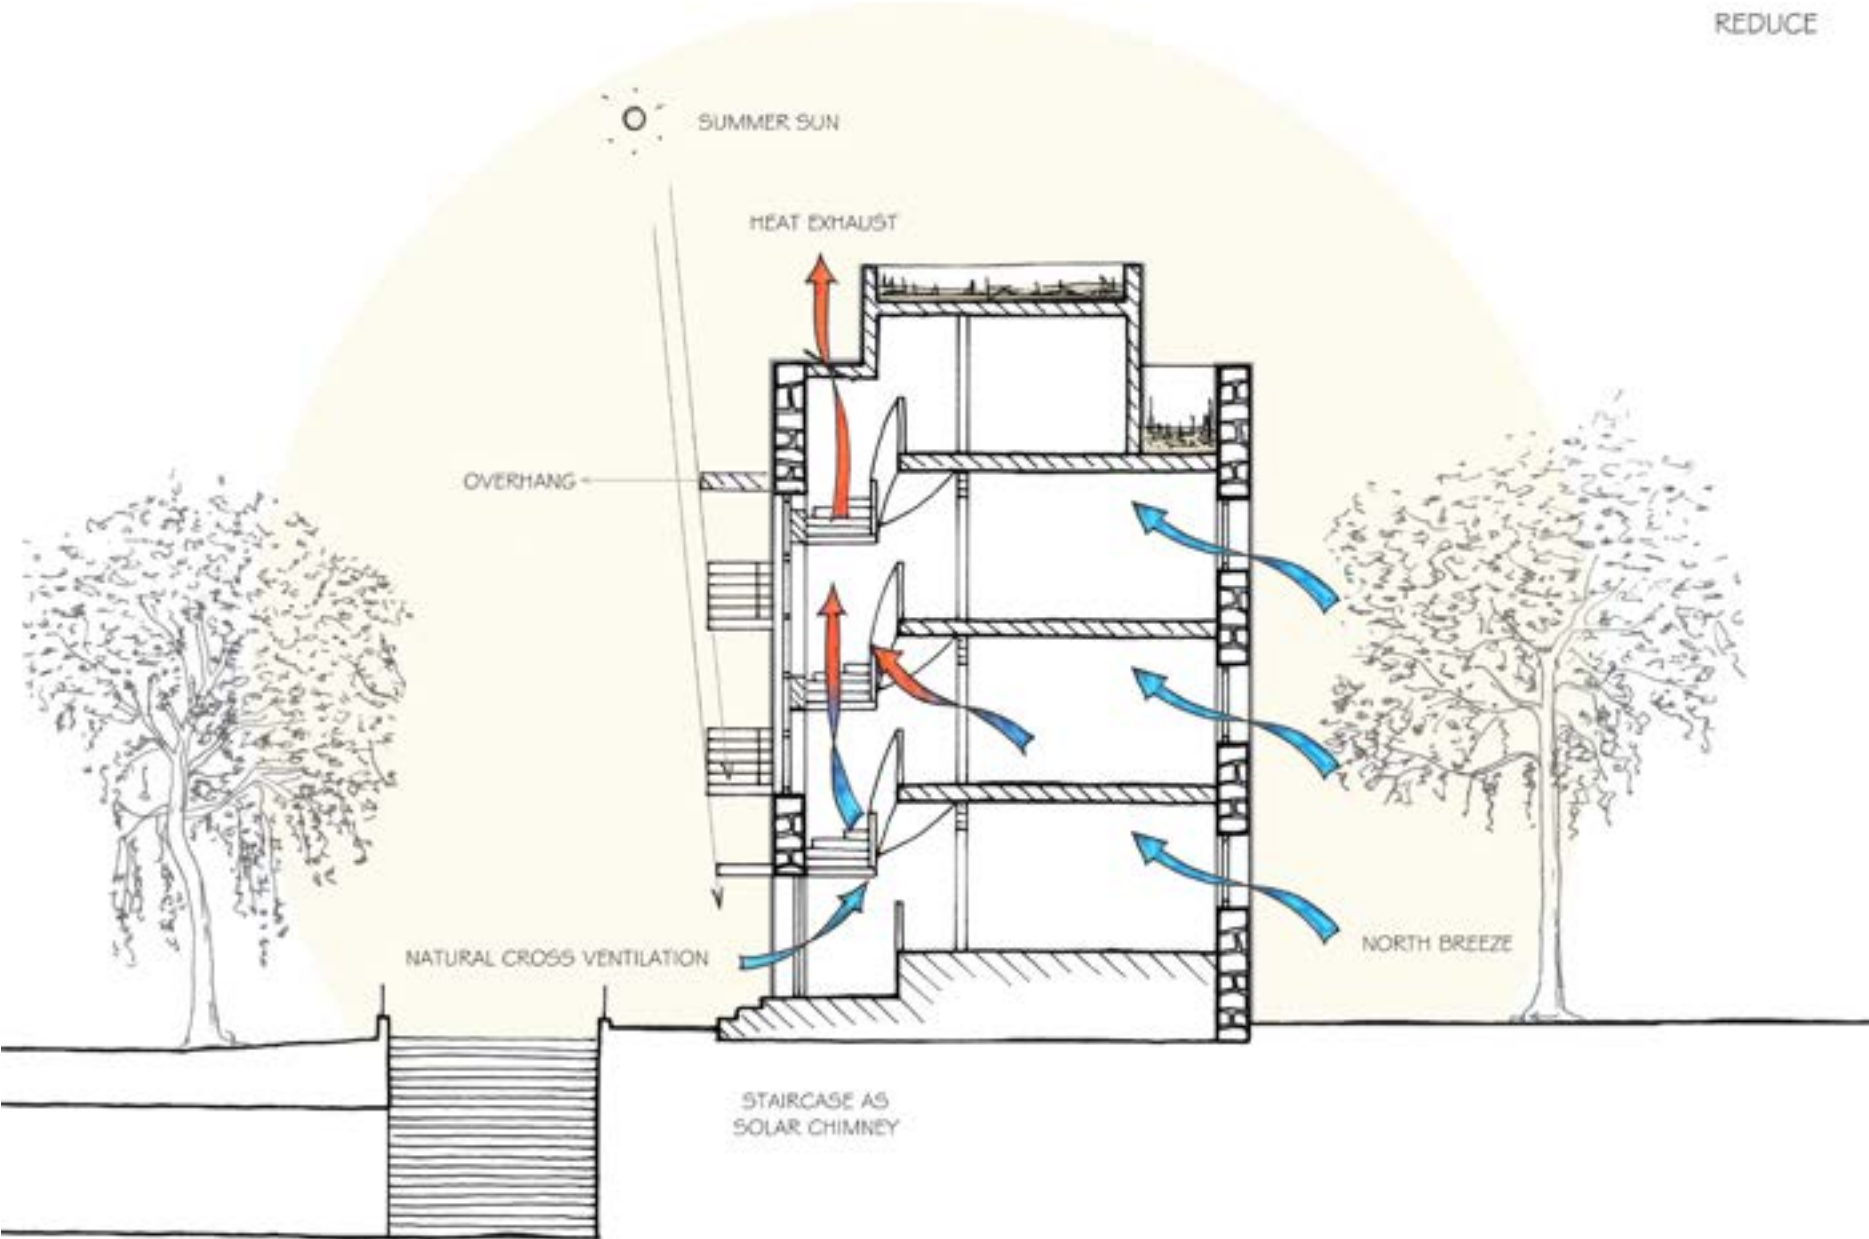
Author (2022). Section of the first building of Prosfygika - Reduce (solar chimney, summer) [Sketch].
